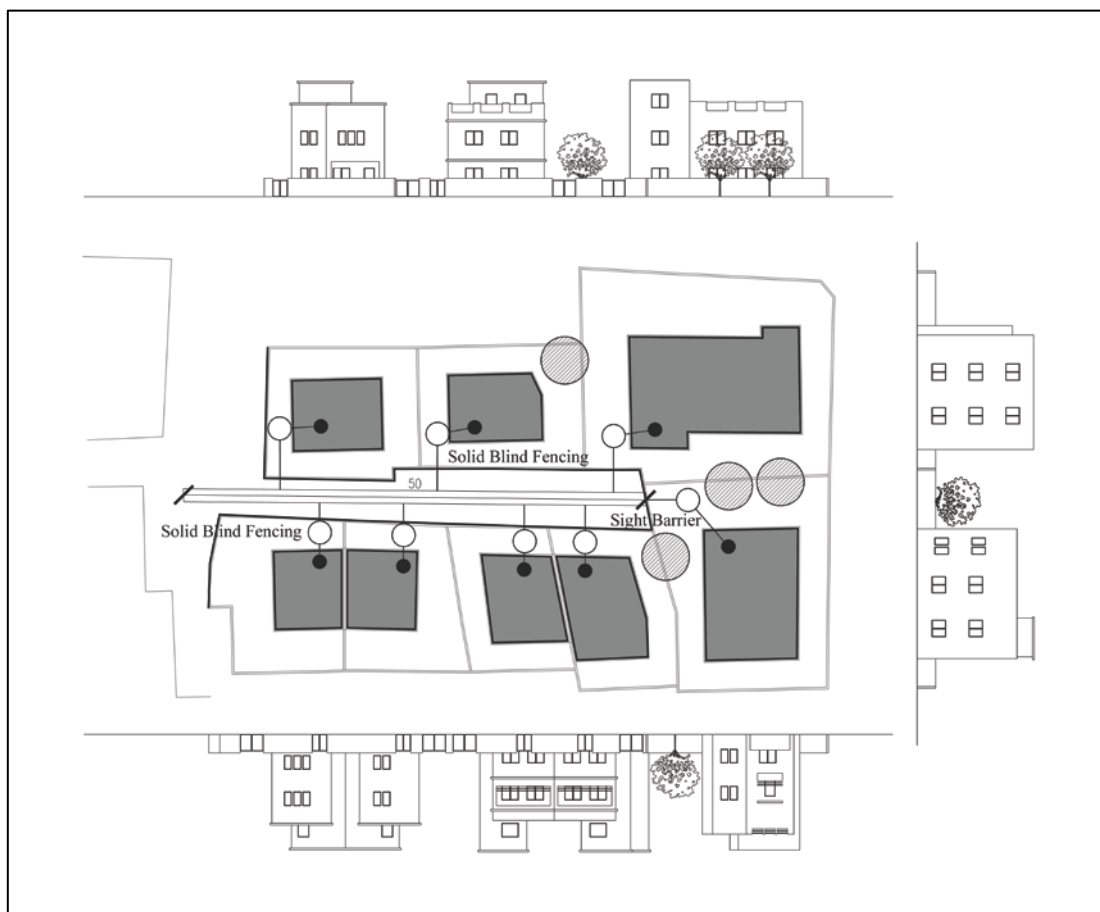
Constitutedness of the ground floor plan on the cul-de-sac of the Garden City
